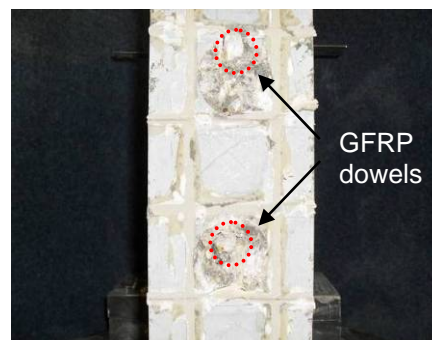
Typical ultimate failure of the concrete studs and GFRP dowels (specimen A₁)
